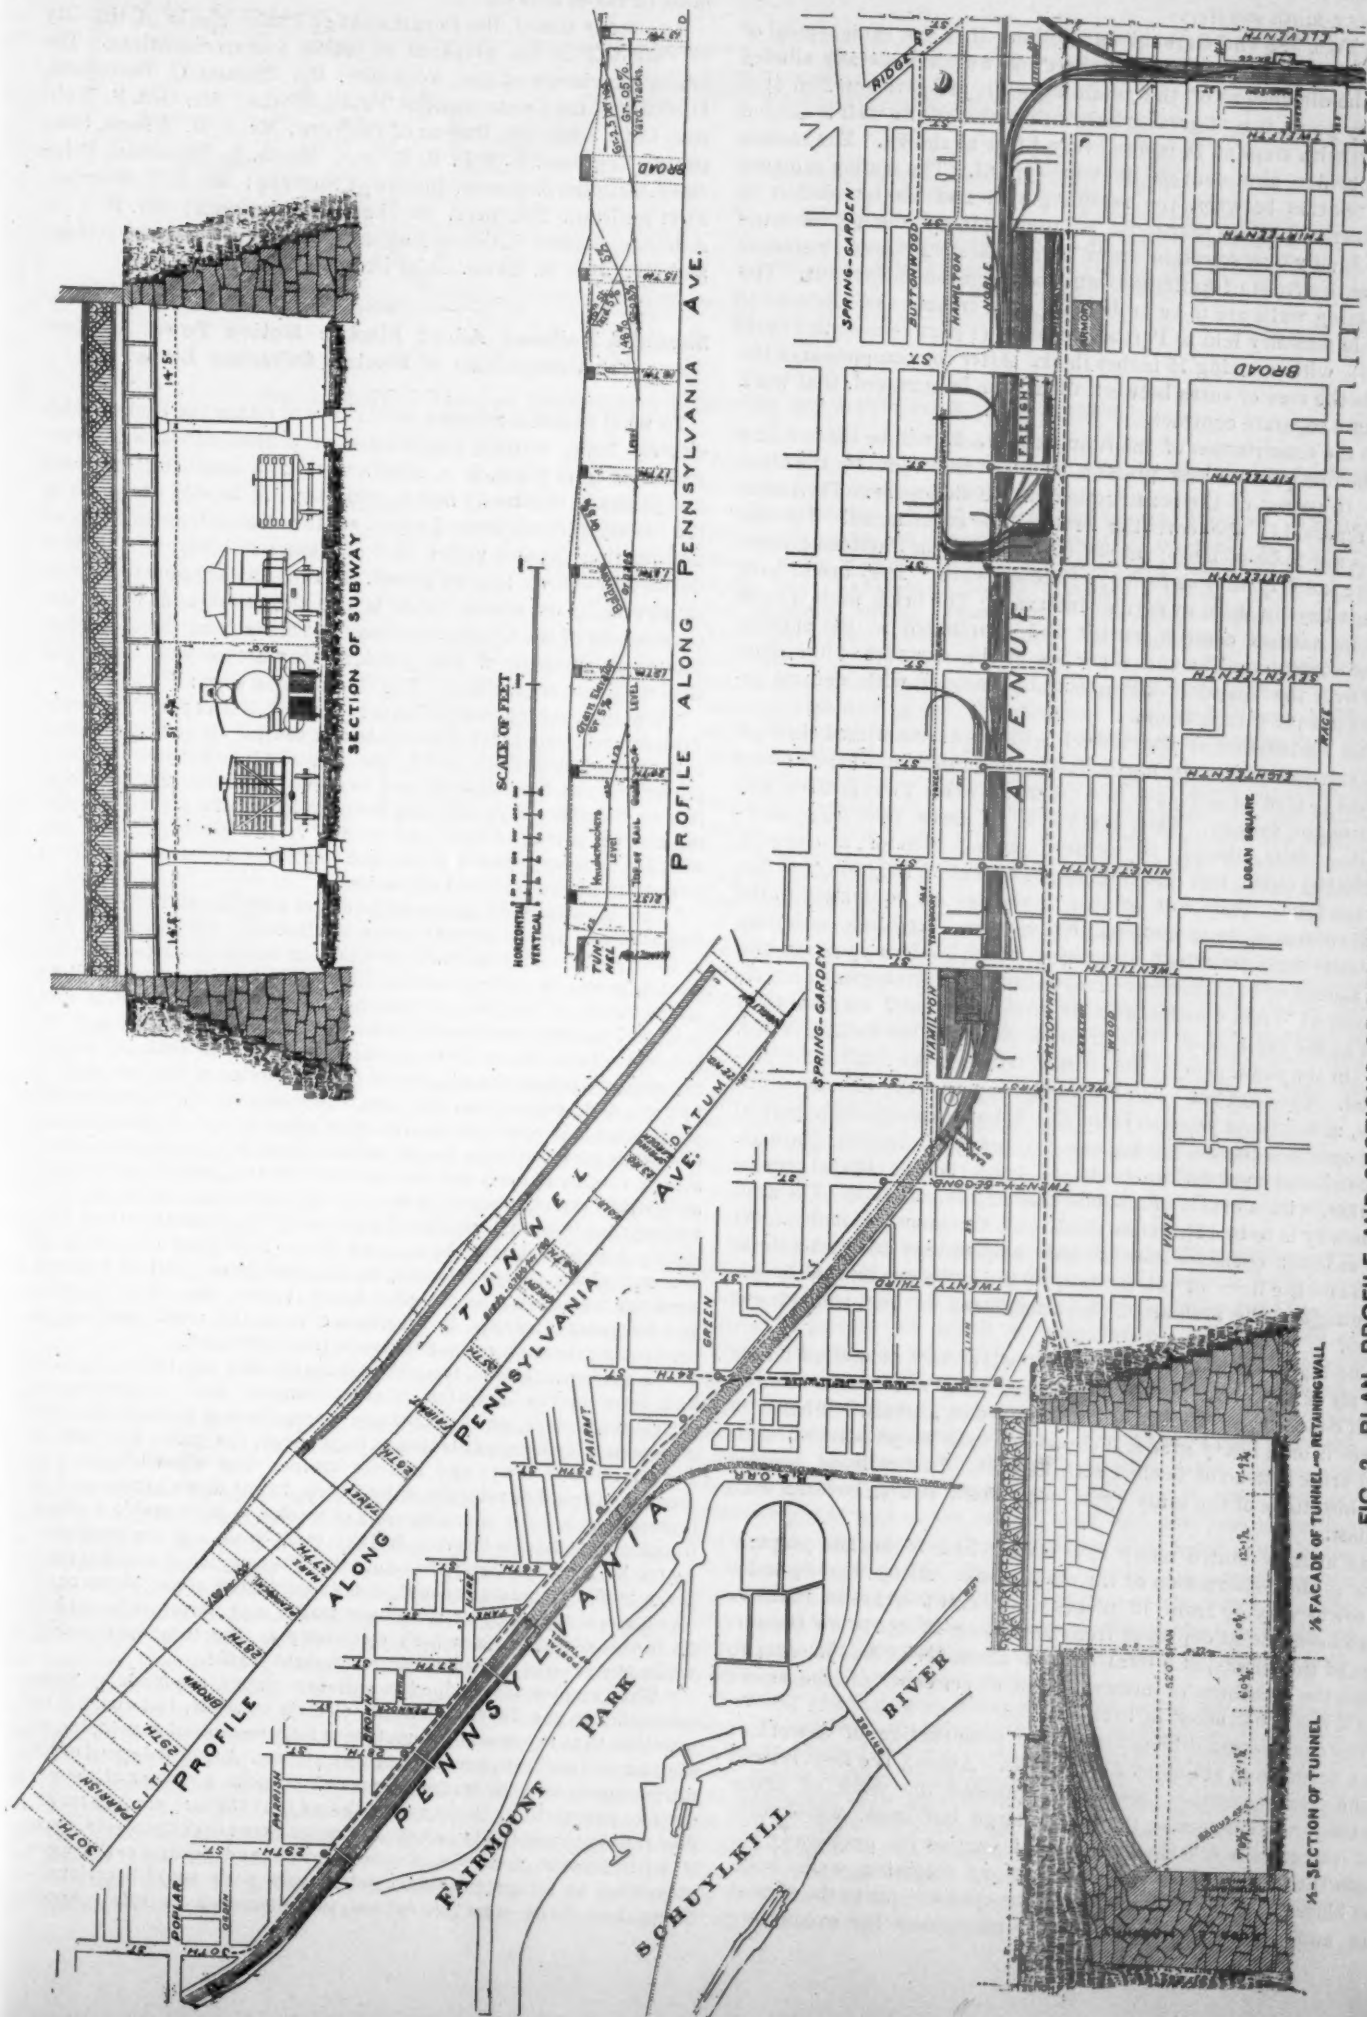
PLAN, PROFILE AND SECTIONS OF PENNSYLVANIA SUBWAY AND TUNNEL.
